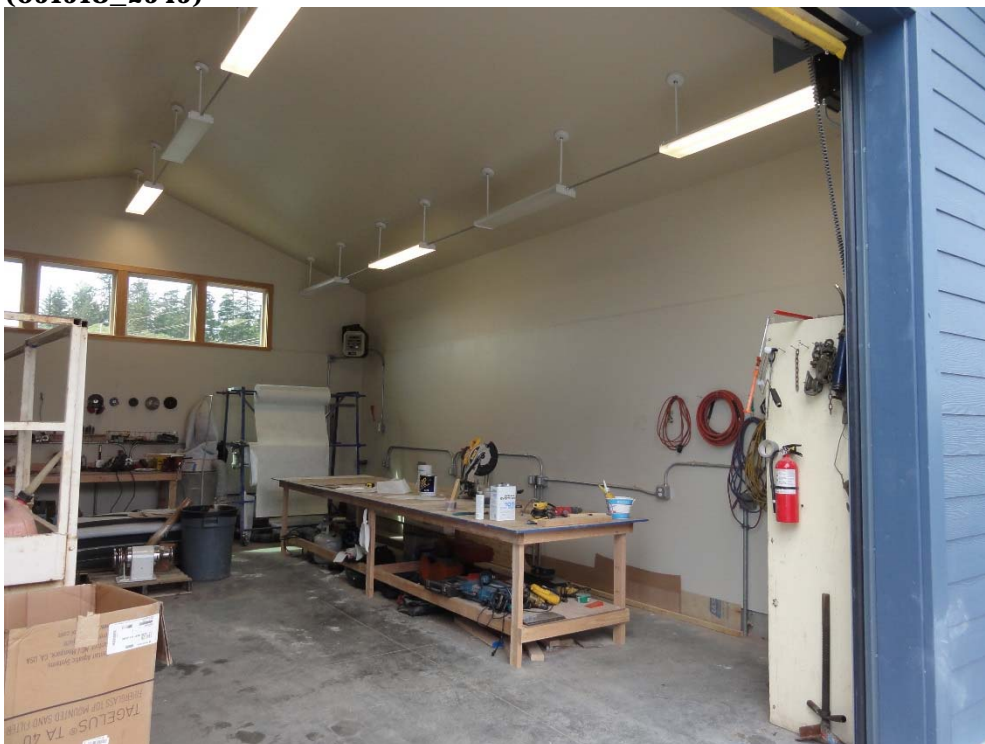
FRONT SIDE OF SHOP BUILDING LOOKING INSIDE. (051518_2546)
